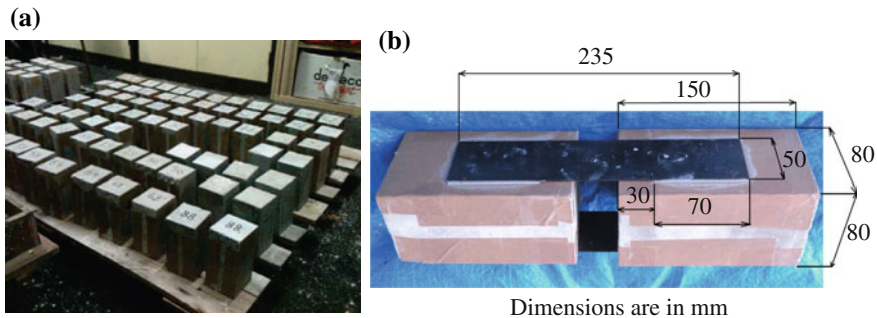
FRP-strengthened concrete specimens: a concrete blocks, b geometry of the specimens
